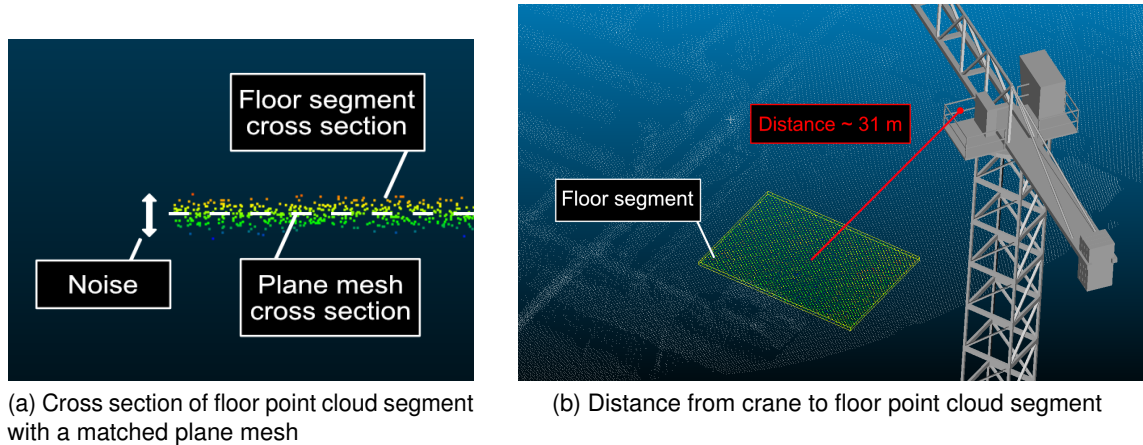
Setup to measure distance from floor point cloud segment to plane mesh (02.11.2022-10:10)
